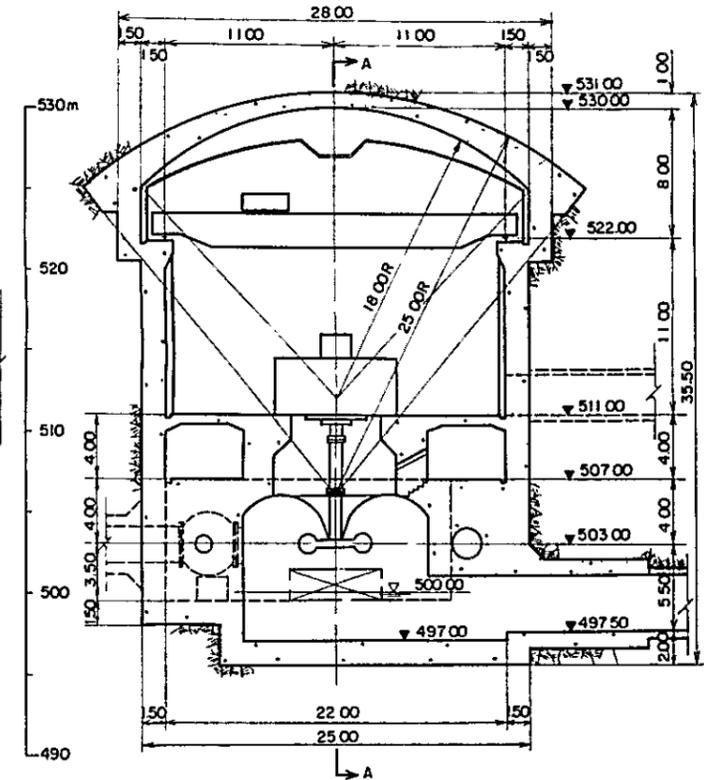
Surge Tank, Penstock, Powerhouse and Tailrace Tunnel (C-3), Profile and Section
